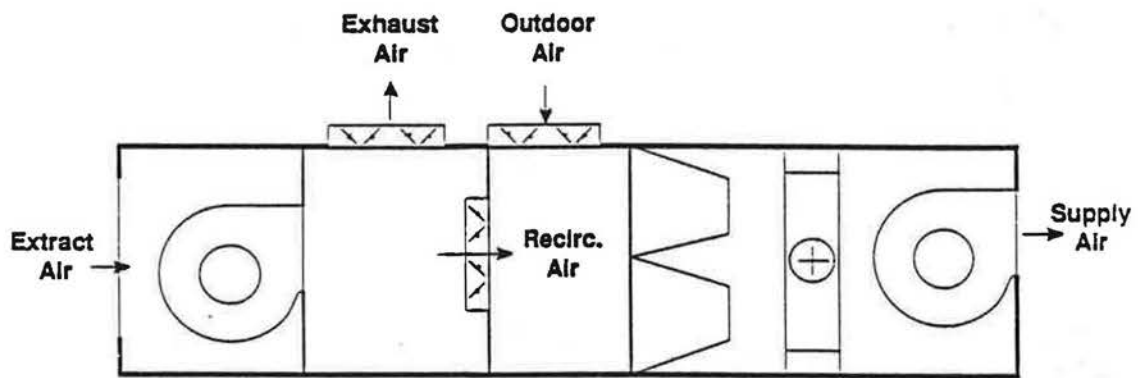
COMBINED SUPPLY / EXHAUST AIR HANDLING UNIT
